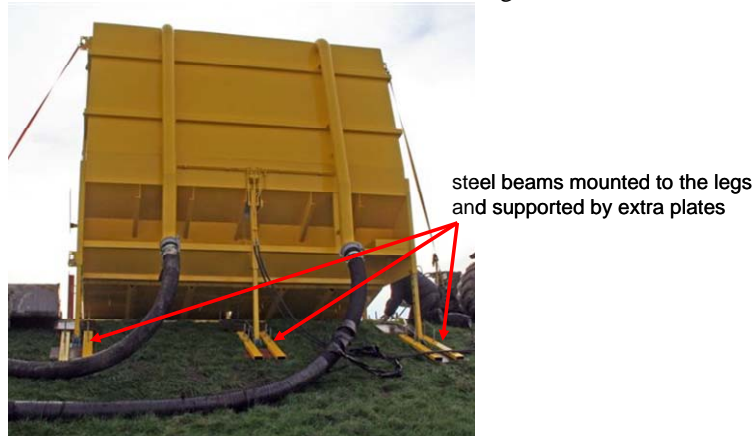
Rear side of simulator. Adjustments to the footings by extra steel girders and plates.
